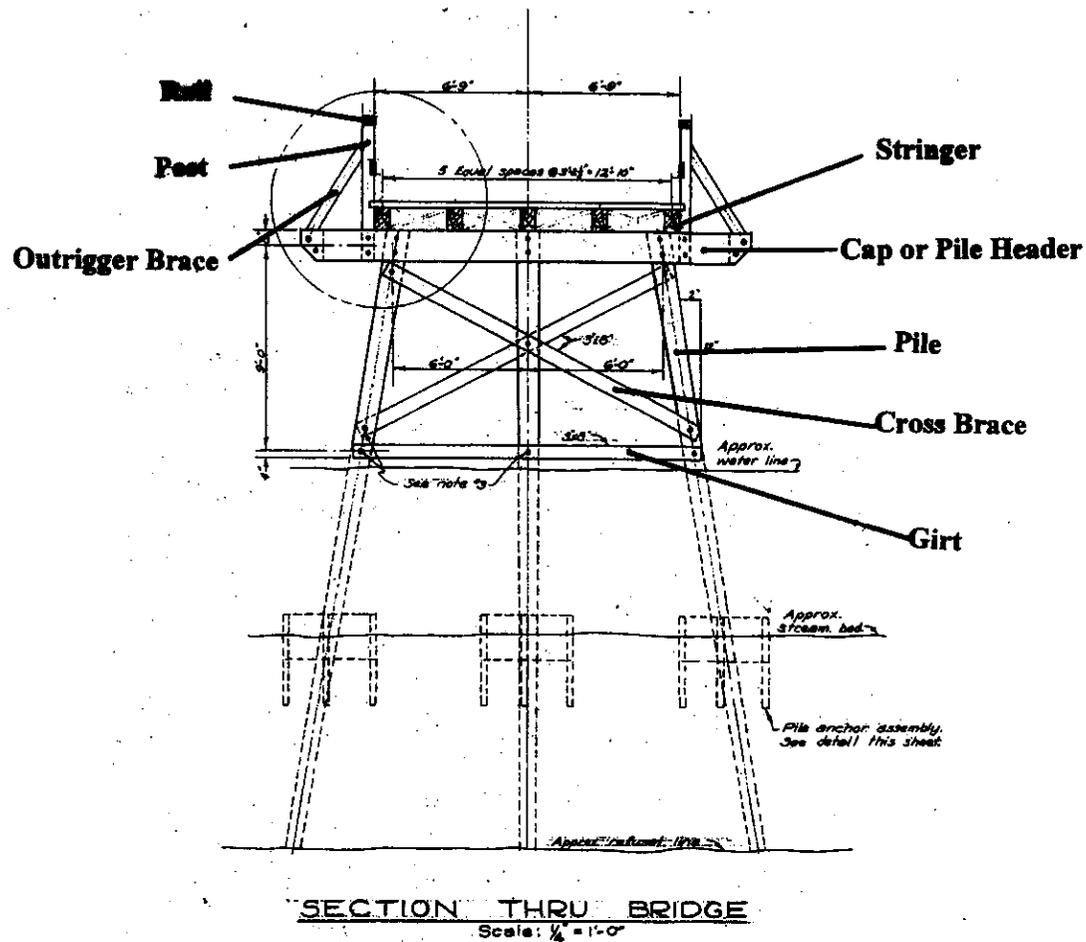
Modern bridge diagram identifying bridge elements. Helpful guide in general understanding of bridge construction.
